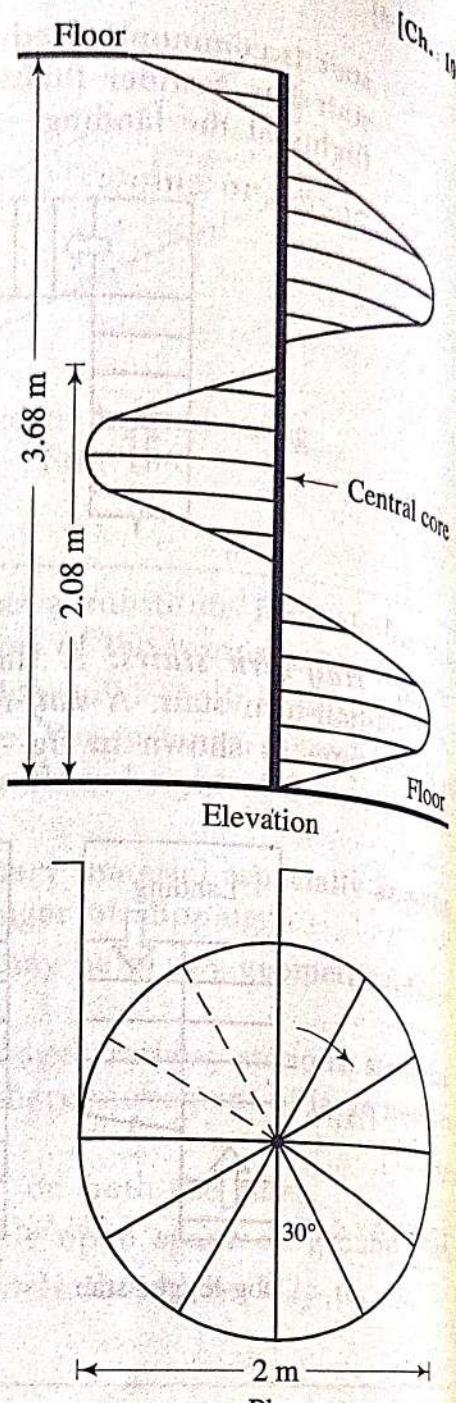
shows the details of a circular stair. The height of floor and rise are respectively 3.68 m and 160 mm. The steps radiate at an angle of 30° from the core. The headroom is 2.08 m and width of stair is 2 m. The handrail is not shown.
